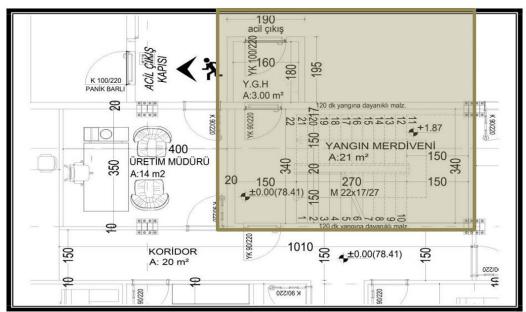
Fire Safety Hall and Fire Staircase Detail
